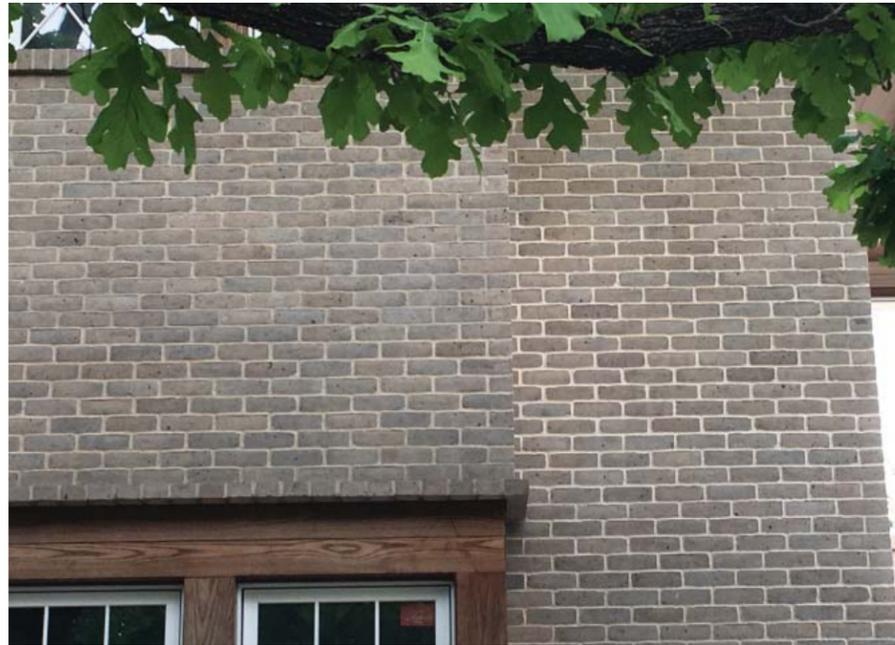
IMAGES OF AUSTIN COMMON MASONRY LEFT EXPOSED AT INTERIOR OF GARAGE AS WELL AS IMAGES OF PAINTED AUSTON COMMON MASONRY AT EXTERIOR OF RESIDENCE.
